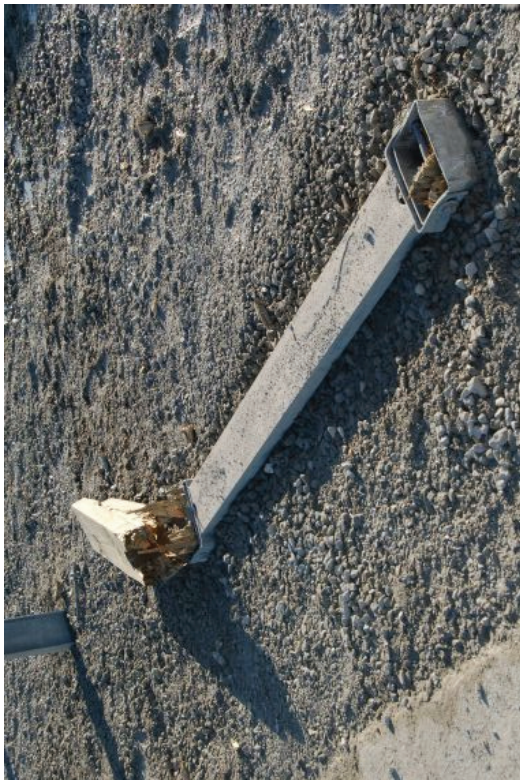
Upstream Anchorage Damage, Test No. MWTSP-1
